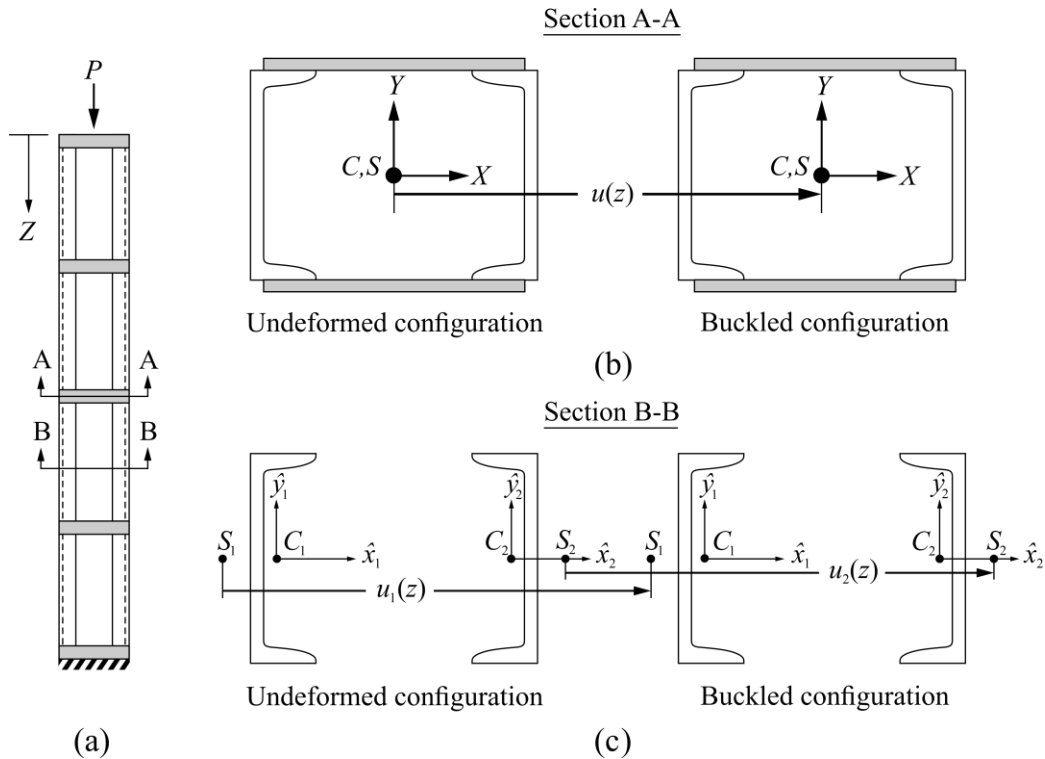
Compression assembly made of widely spaced double channels with battens (a) Elevation view (b) Cross-sectional view A-A at battens, and (c) Cross-sectional view B-B away from battens.
